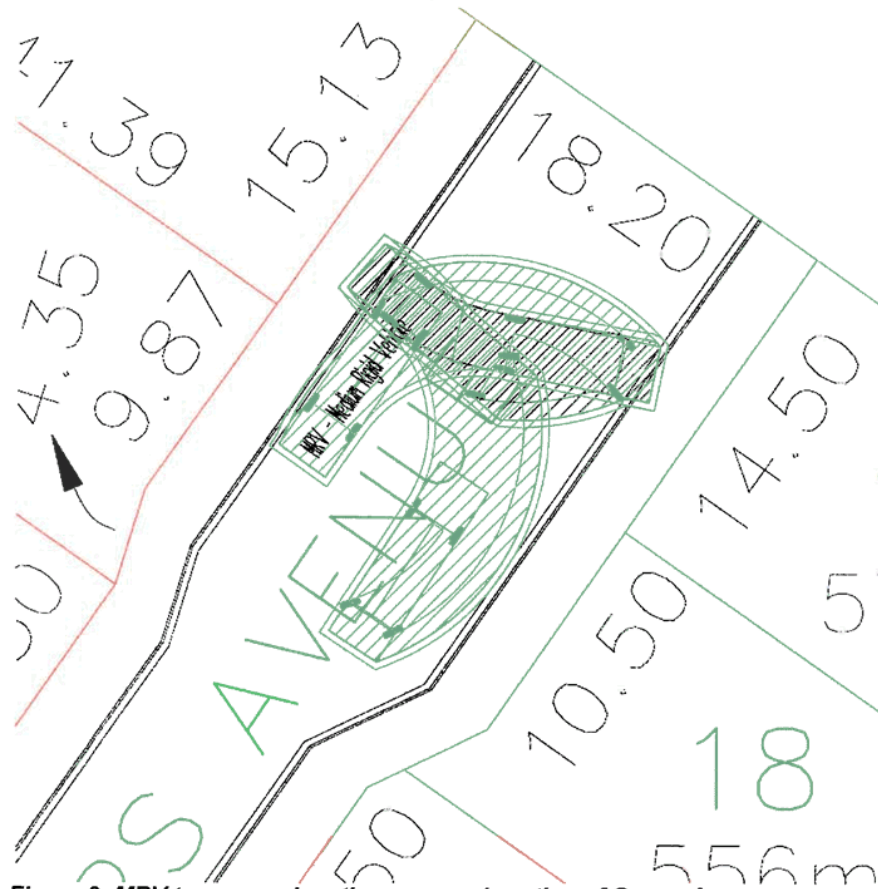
MRV turnaround on the proposed section of Gepps Avenue
